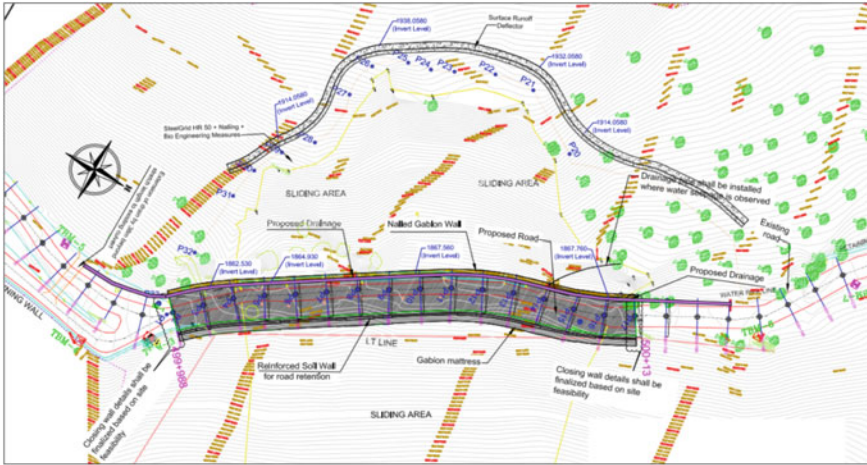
Drainage plan showing mitigation measures on hill side of the road
